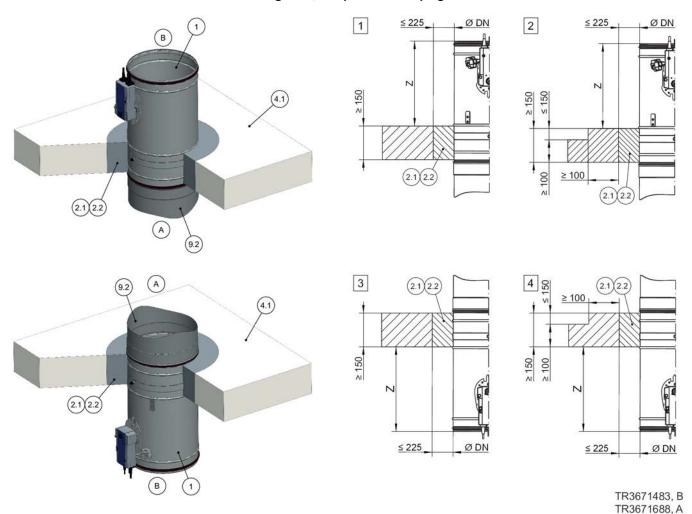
Mortar-based installation into a solid ceiling slab, suspended or upright
